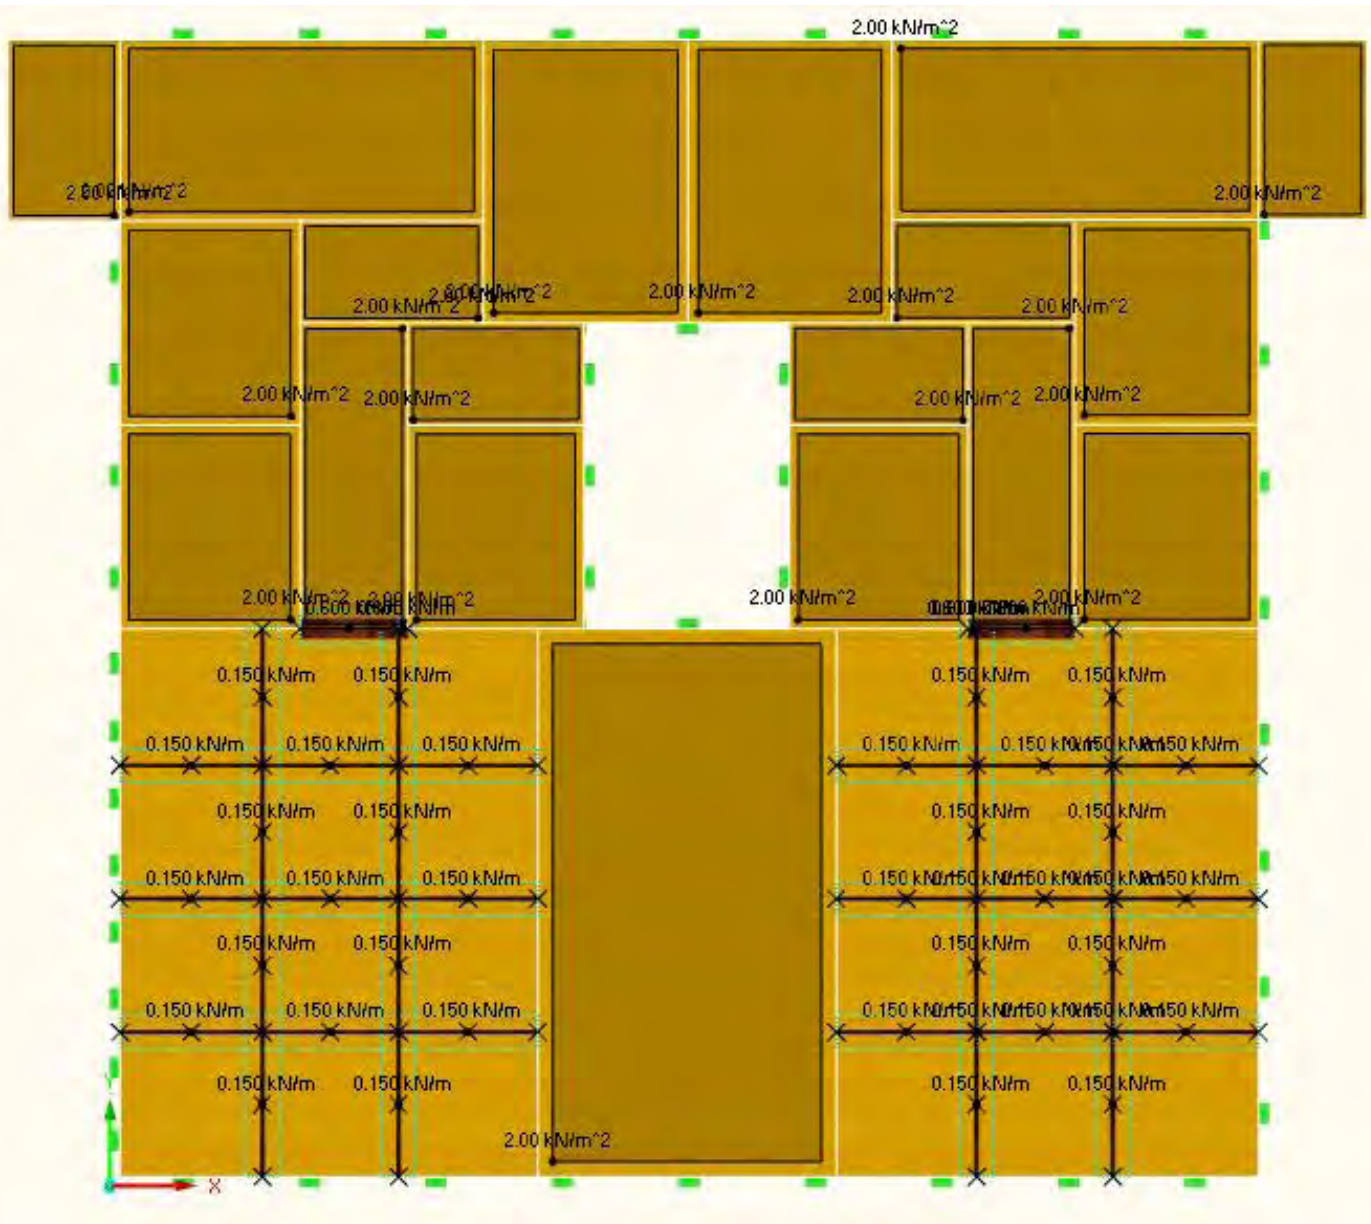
Assign of Finishing and Live Loads on Typical Floor (KN-M Units)
